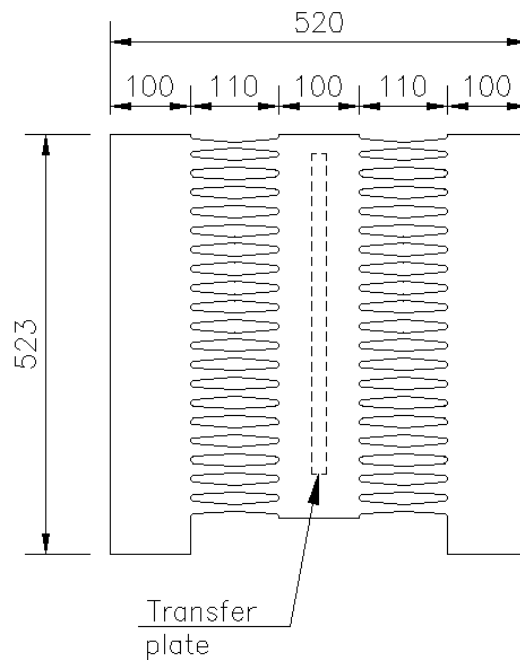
Slit damper used for specimen P-SD-1, dimensions in mm.
